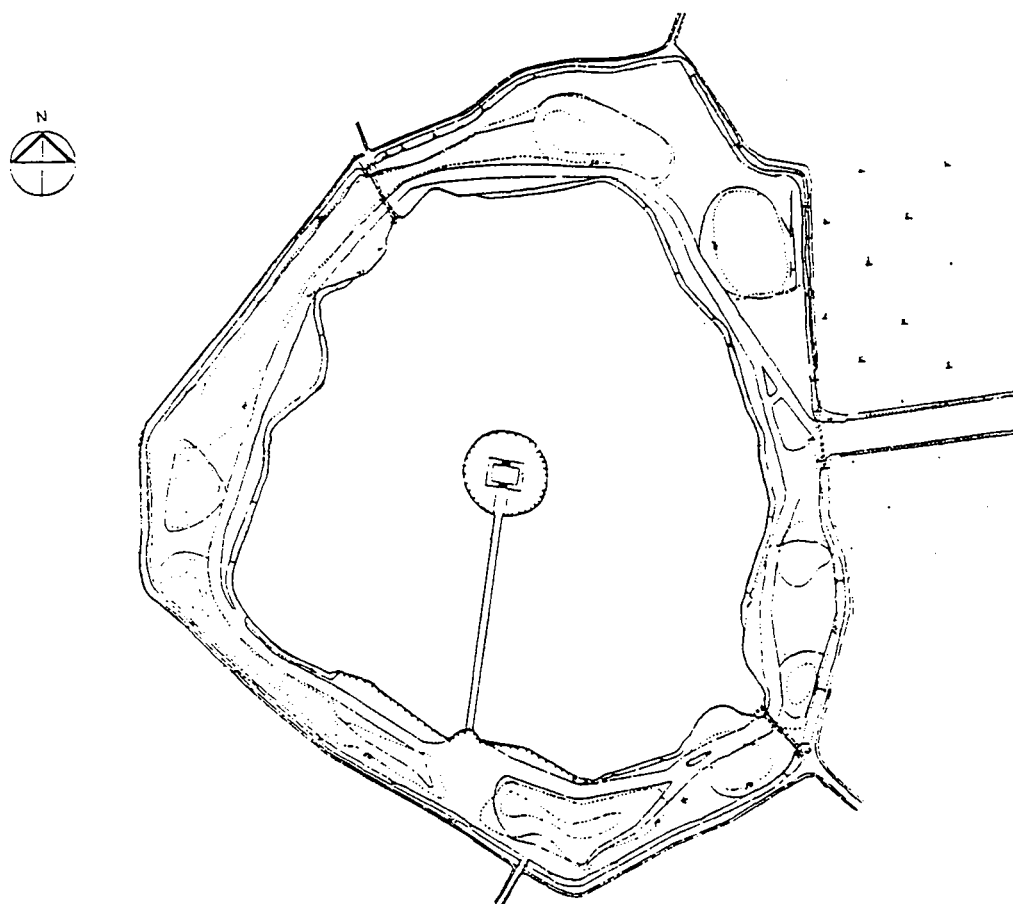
Layout plan of Kung-nam-chi 宮南池 궁남지 with the recently reconstructed wooden bridge (634 AD, scale: 1 : 2,000) (after: *MHCSRBS* 94 - 1, p. 582)
